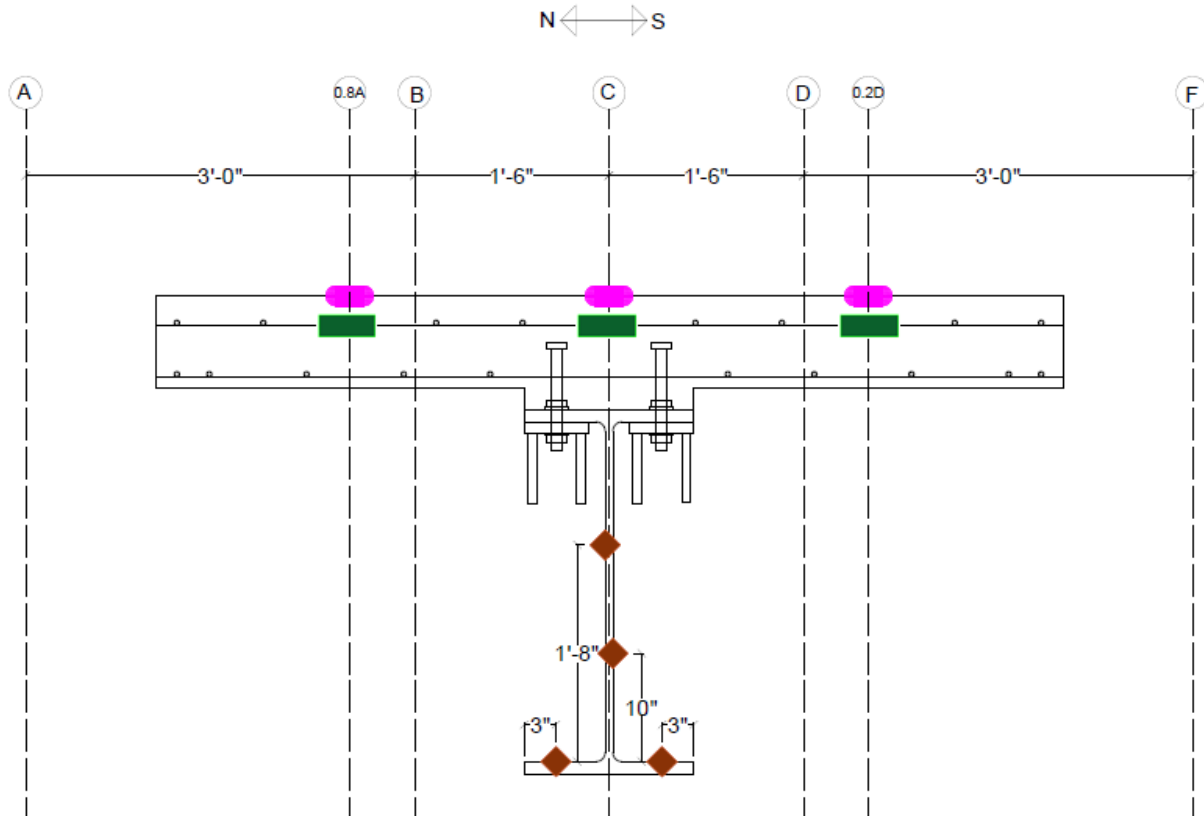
Concept B Instrumentation Plan (Section View at E1).
